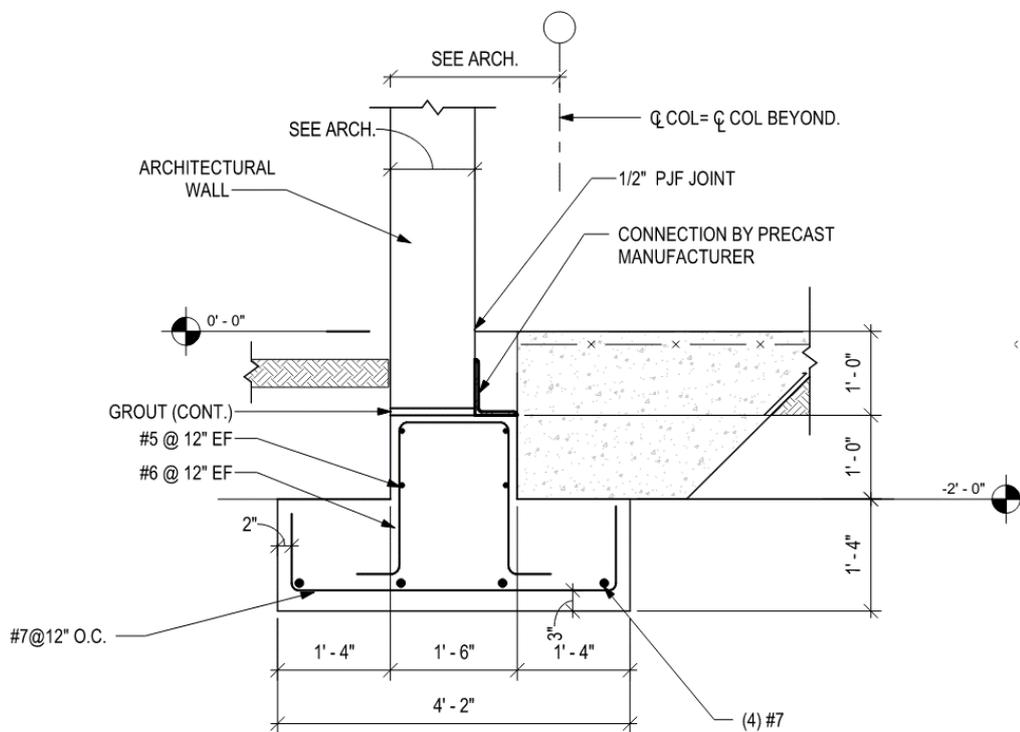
Precast Wall Support Detail – 65% Design Drawings
